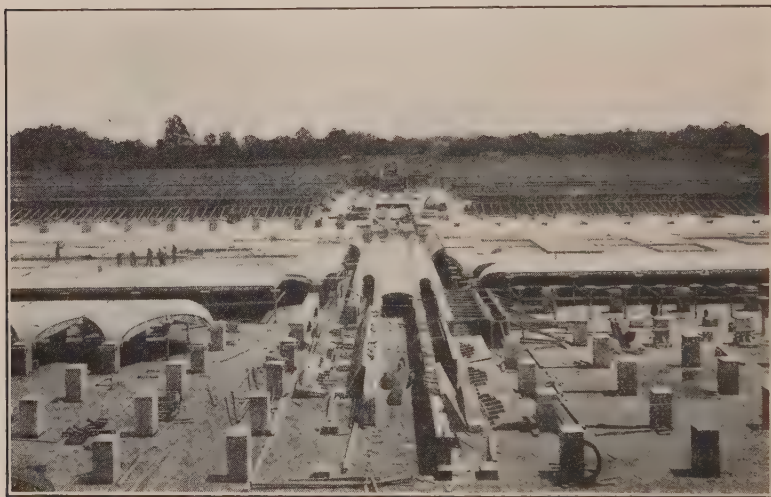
Construction, Queen Lane Water Filtration Works, Philadelphia, Pa. This work was built in sections, necessitating construction joints, in which slight leakage occurred; remainder was water-tight.
